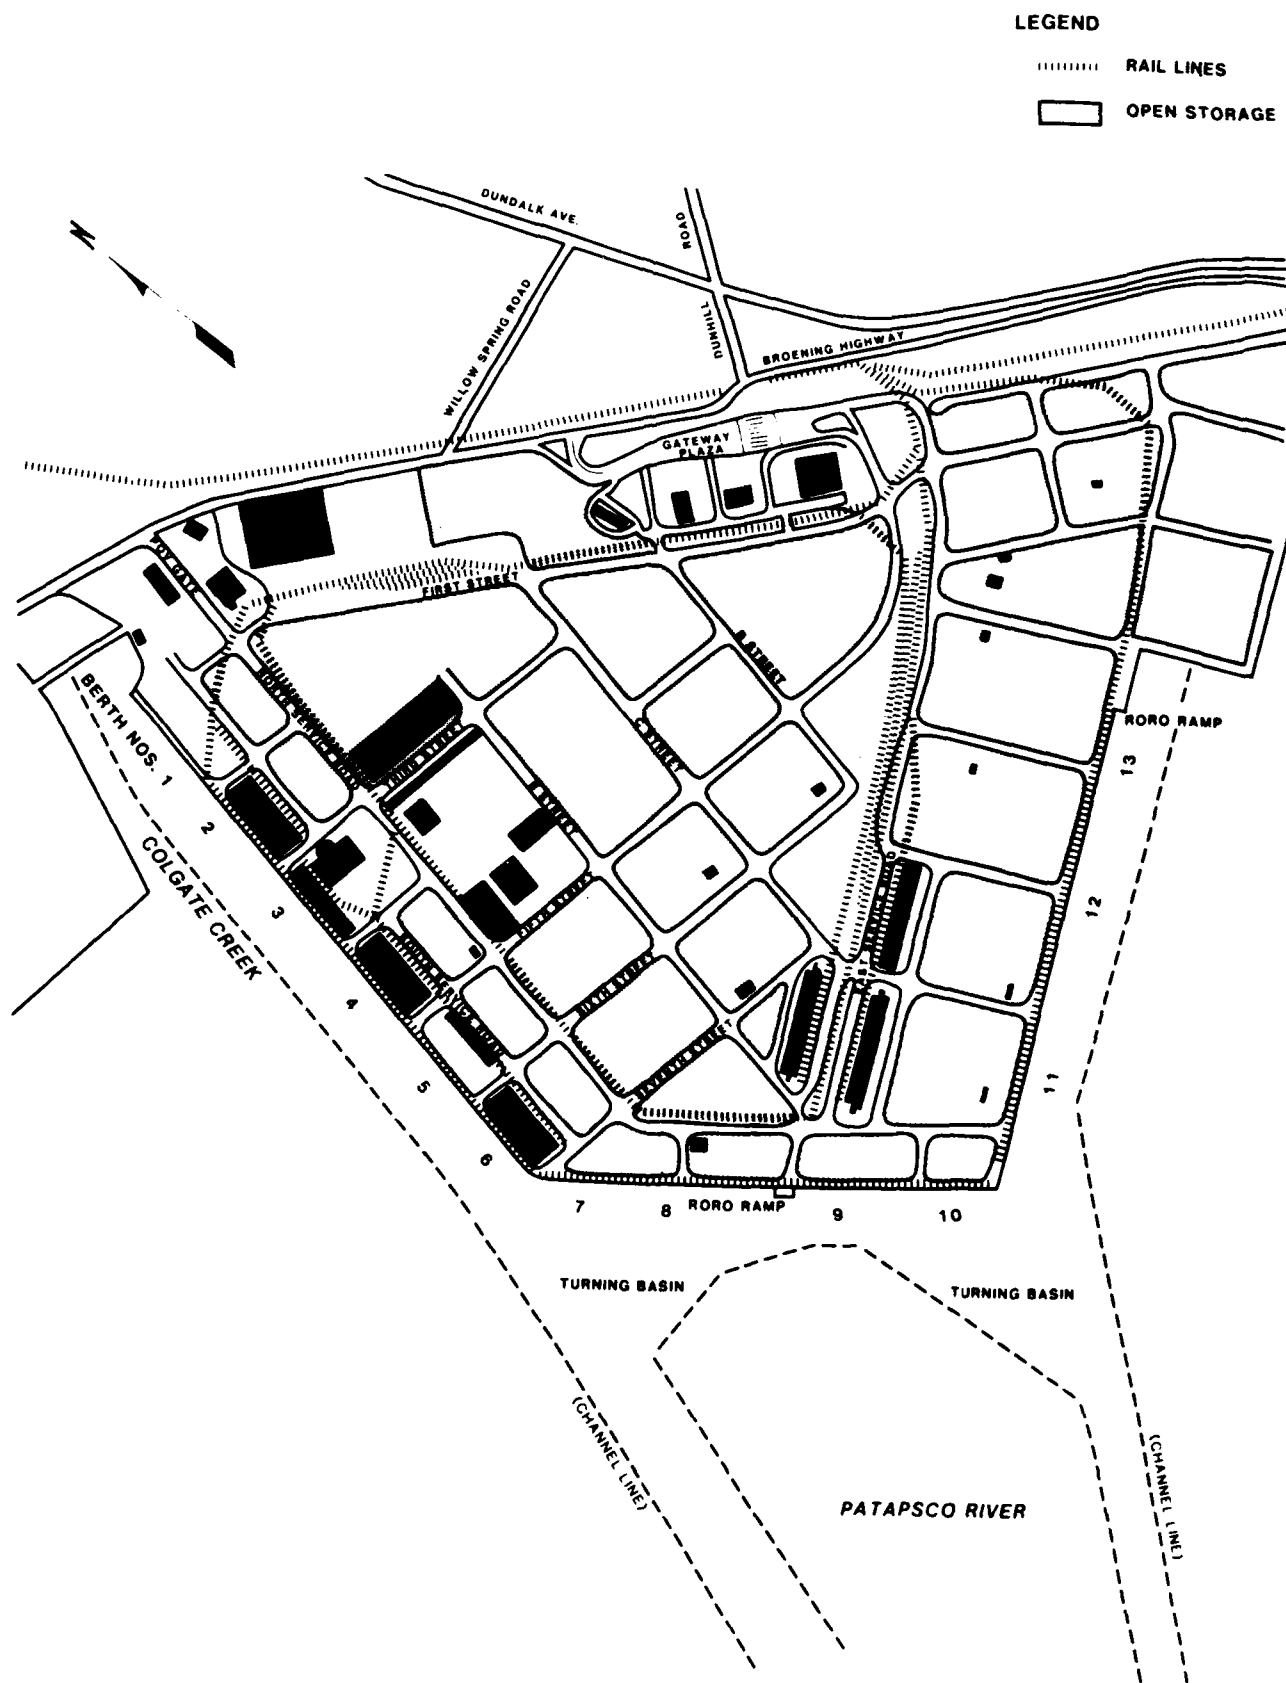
Plan of Dundalk Marine Terminal.
